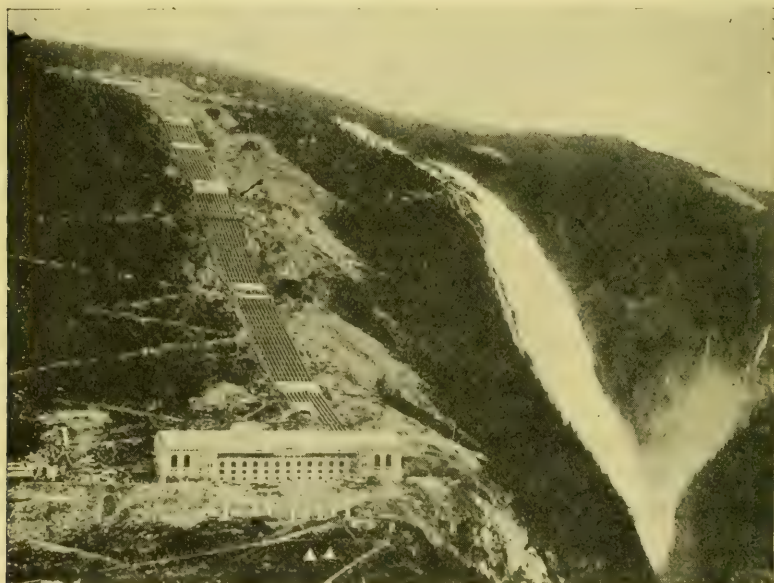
Large Hydro-Electric Power Station at Rjukan, Norway, Showing Ten Five-foot Penstocks and Method of Anchoring Same.
